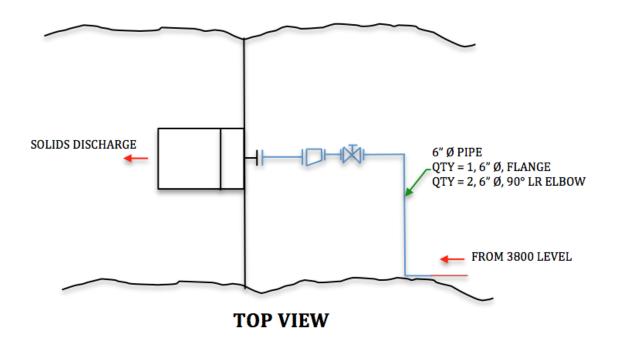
Detailed top view outlining remaining inlet components for pipe modification [30].
